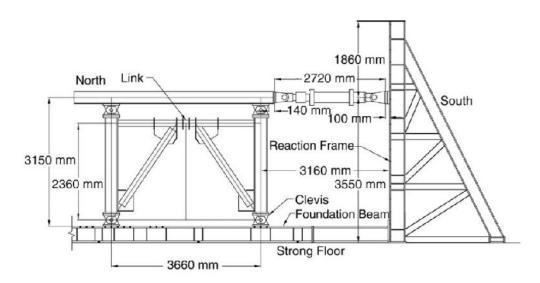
Proof-of-concept test setup in elevation (Berman J. W., et al.;2007)
